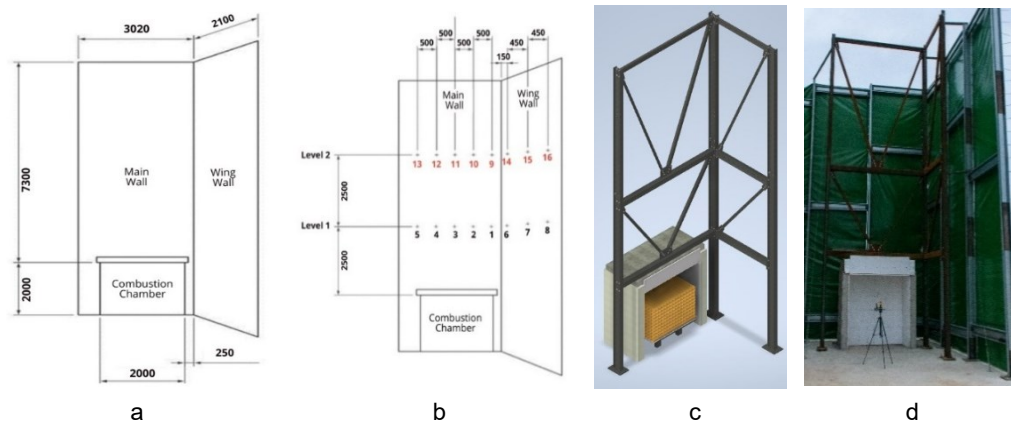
Experimental system: a. Specimen dimensions; b. Instrumentation position; c. Corner perspective; d. Test apparatus;
